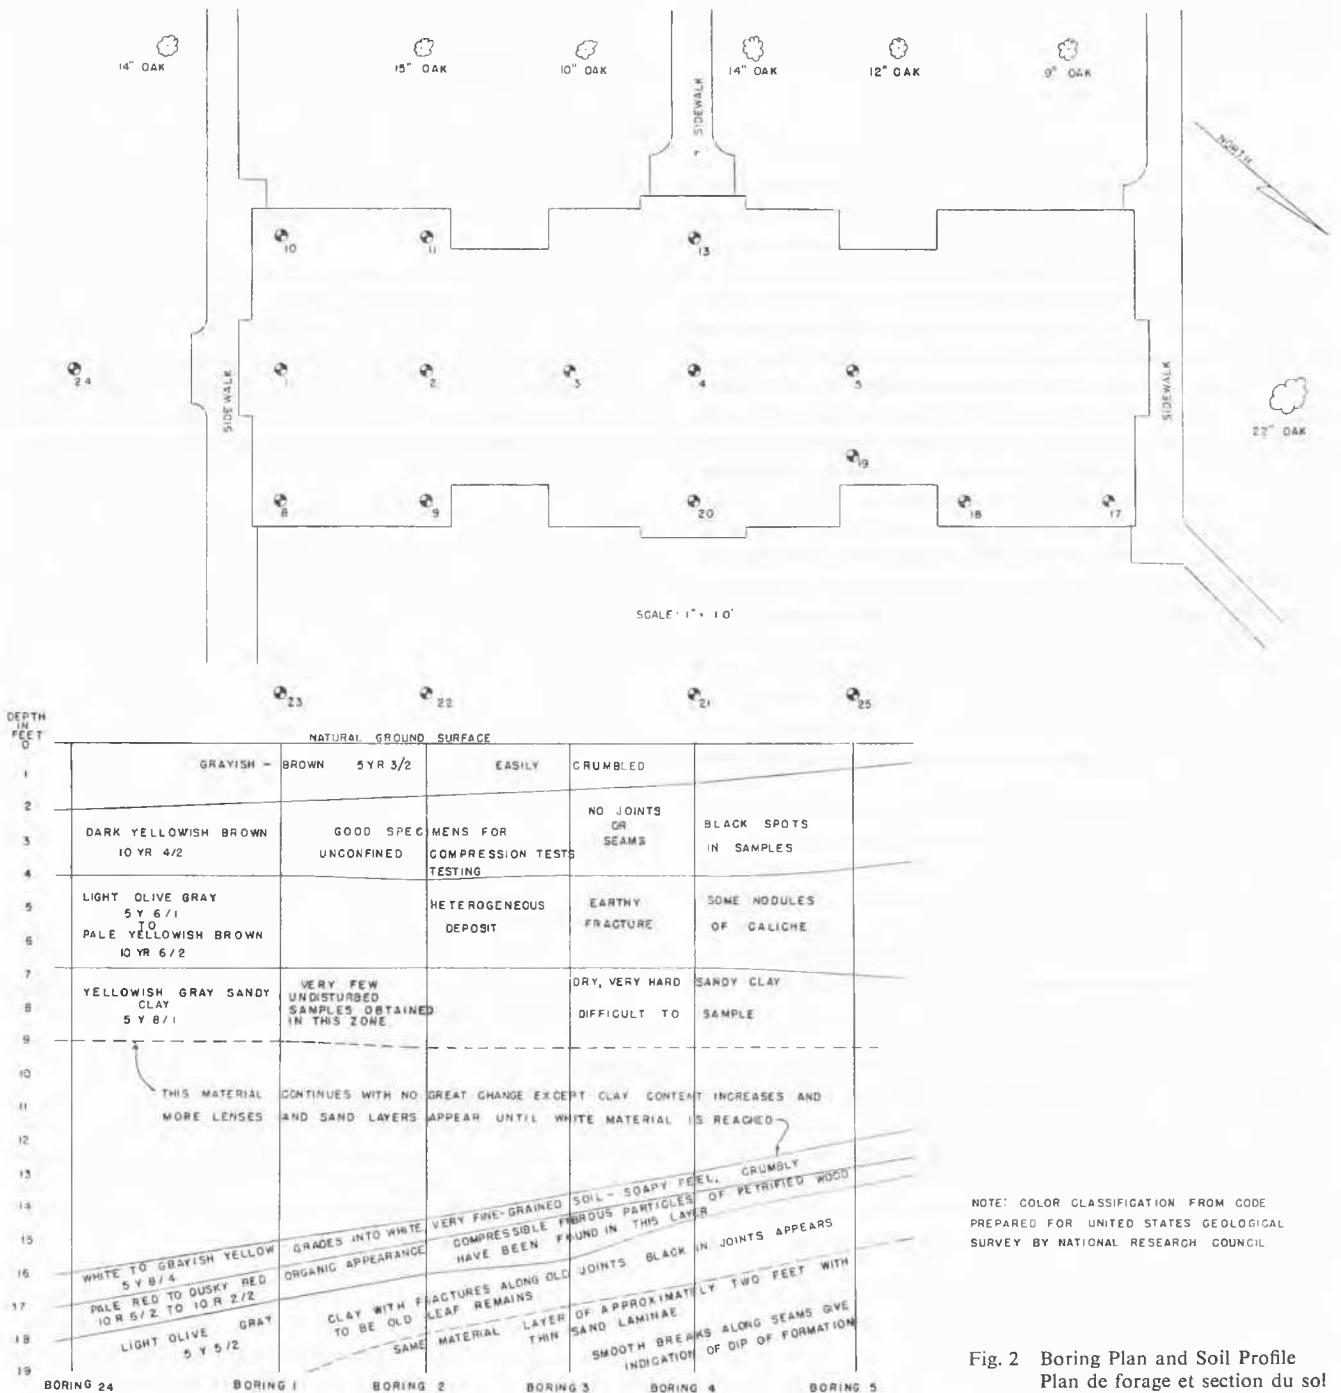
Boring Plan and Soil Profile Plan de forage et section du sol
